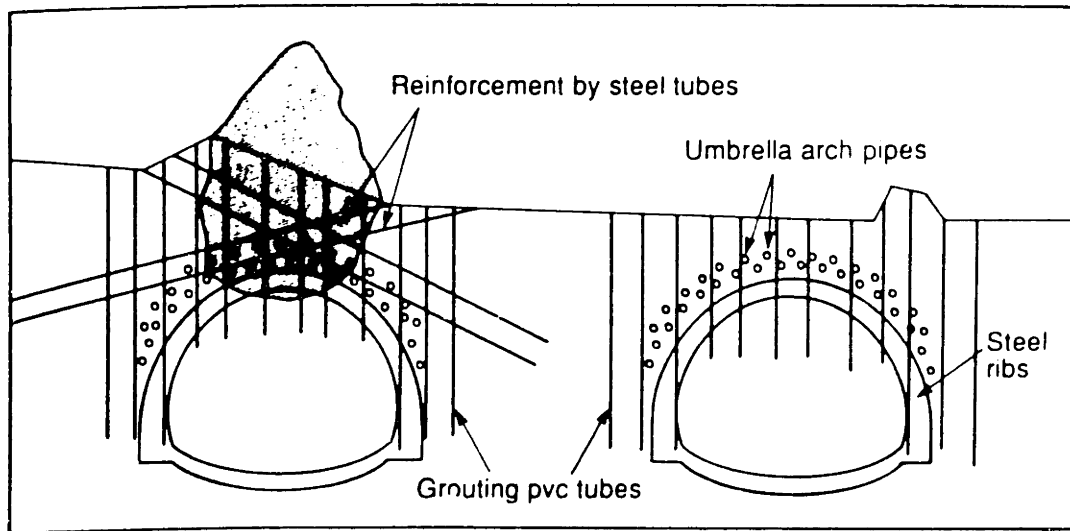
Grouting from ground surface: Ramat Tunnel (Pelizza et al., 1990)
